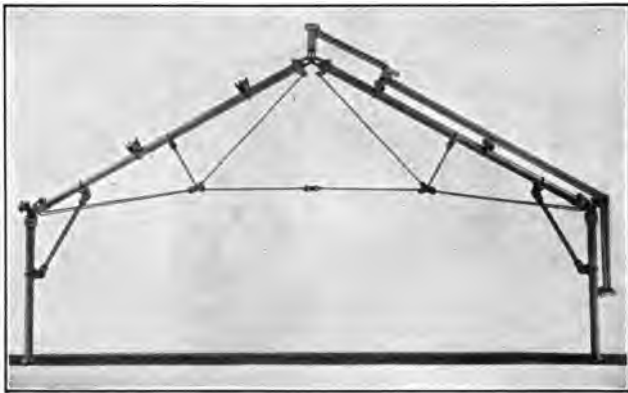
Section of truss-frame greenhouse. The frame is made of gaspipe
